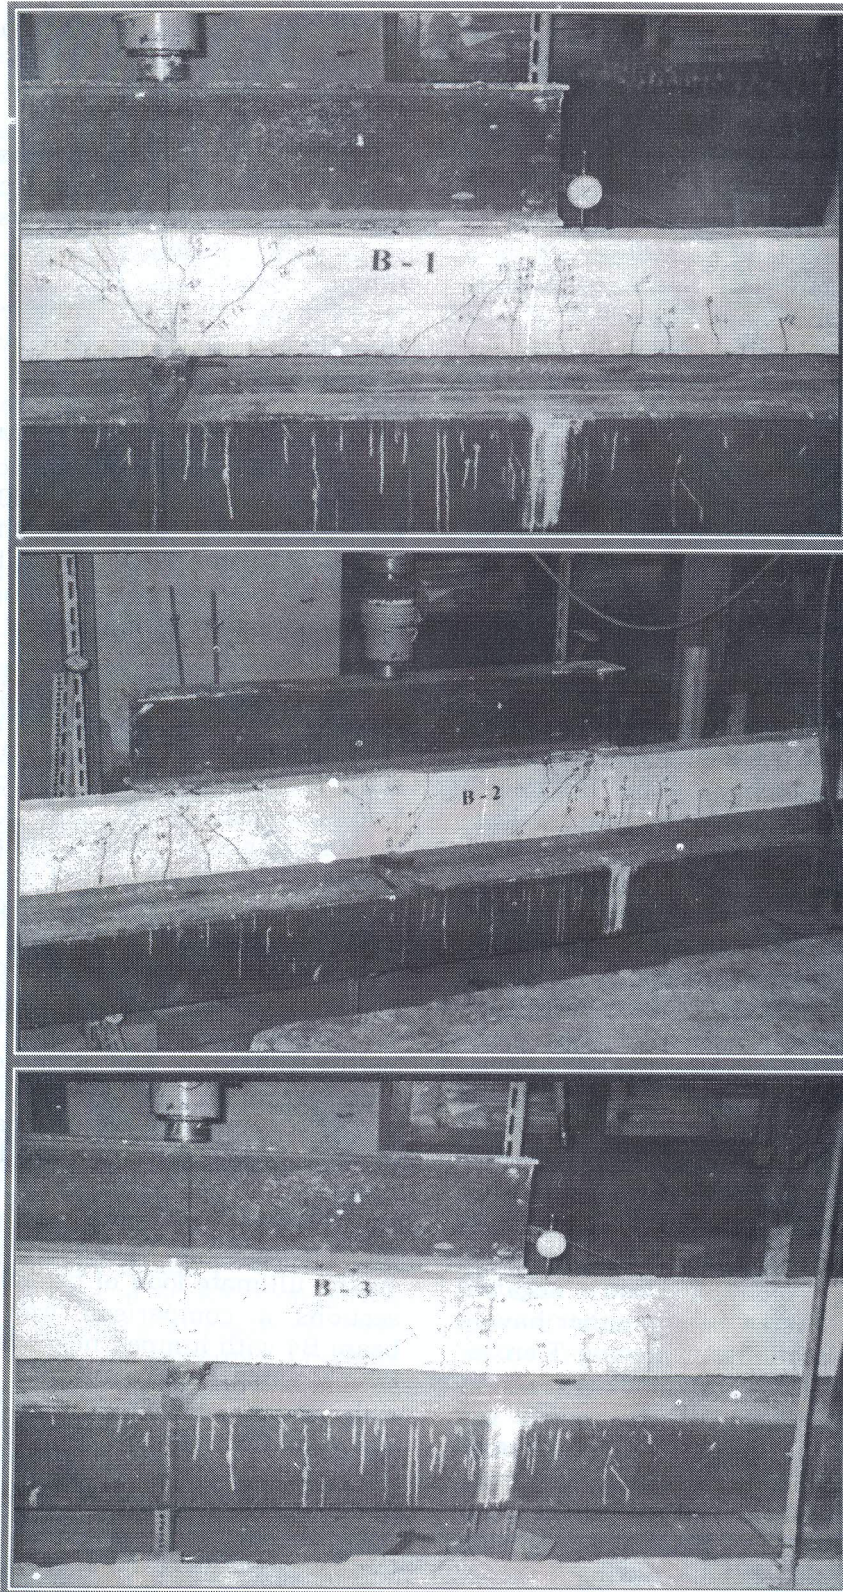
Cracking patterns of tested rectangular beams after failure.
